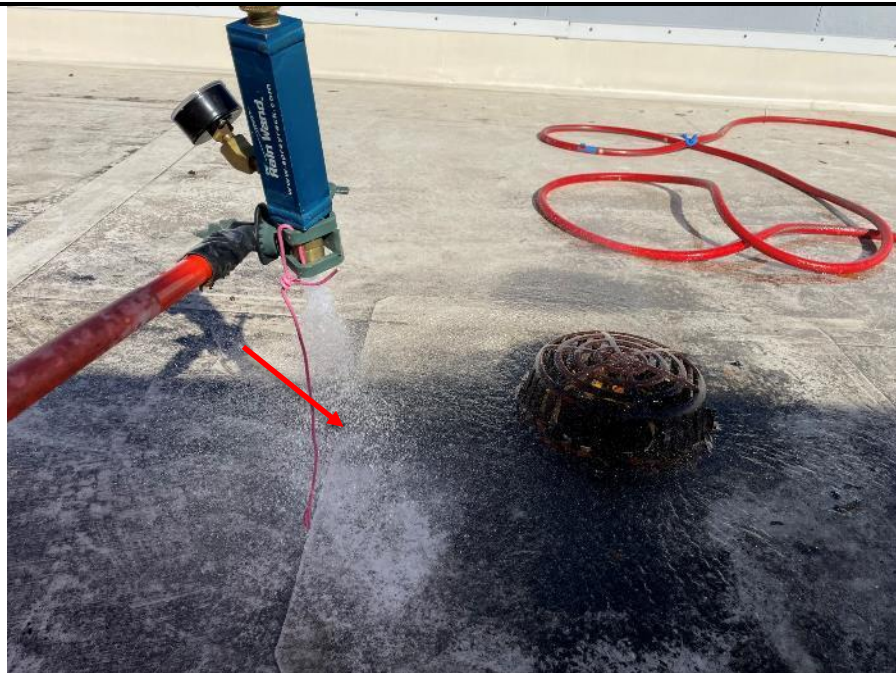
Test location #1 - water was applied along the roofing membrane transition from the field to the internal roof drain.
